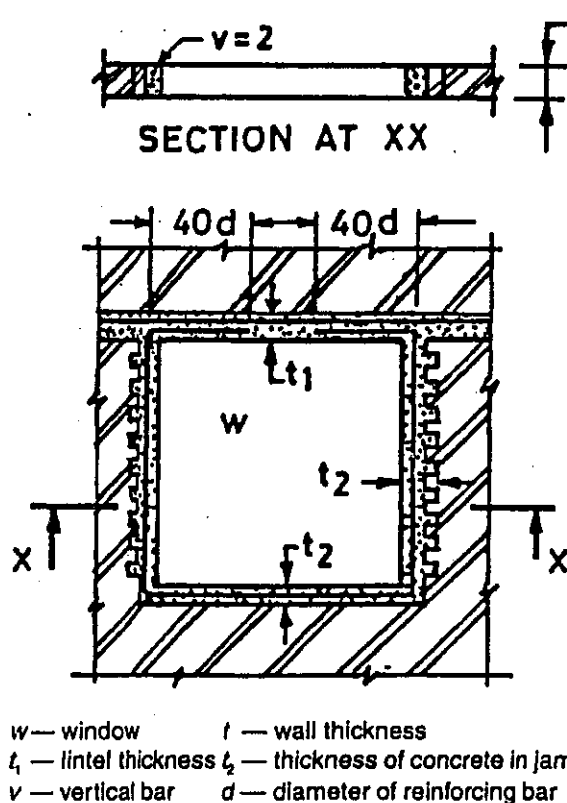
STRENGTHENING MASONRY AROUND OPENINGS
